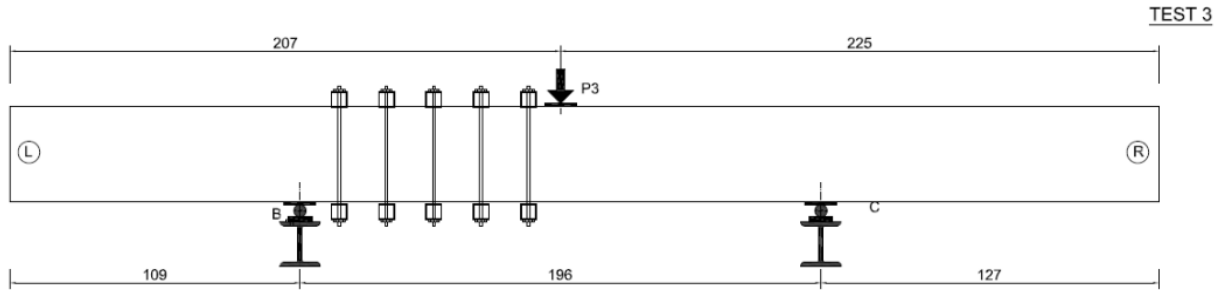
Girder 1-Test 3 configuration (dimensions in inches)
